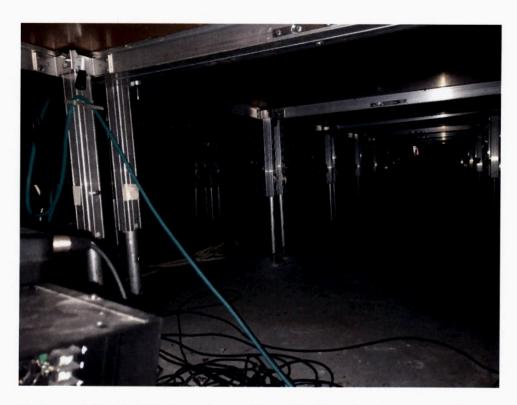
Floor framing of Projection Room for West Cinema Theaters
